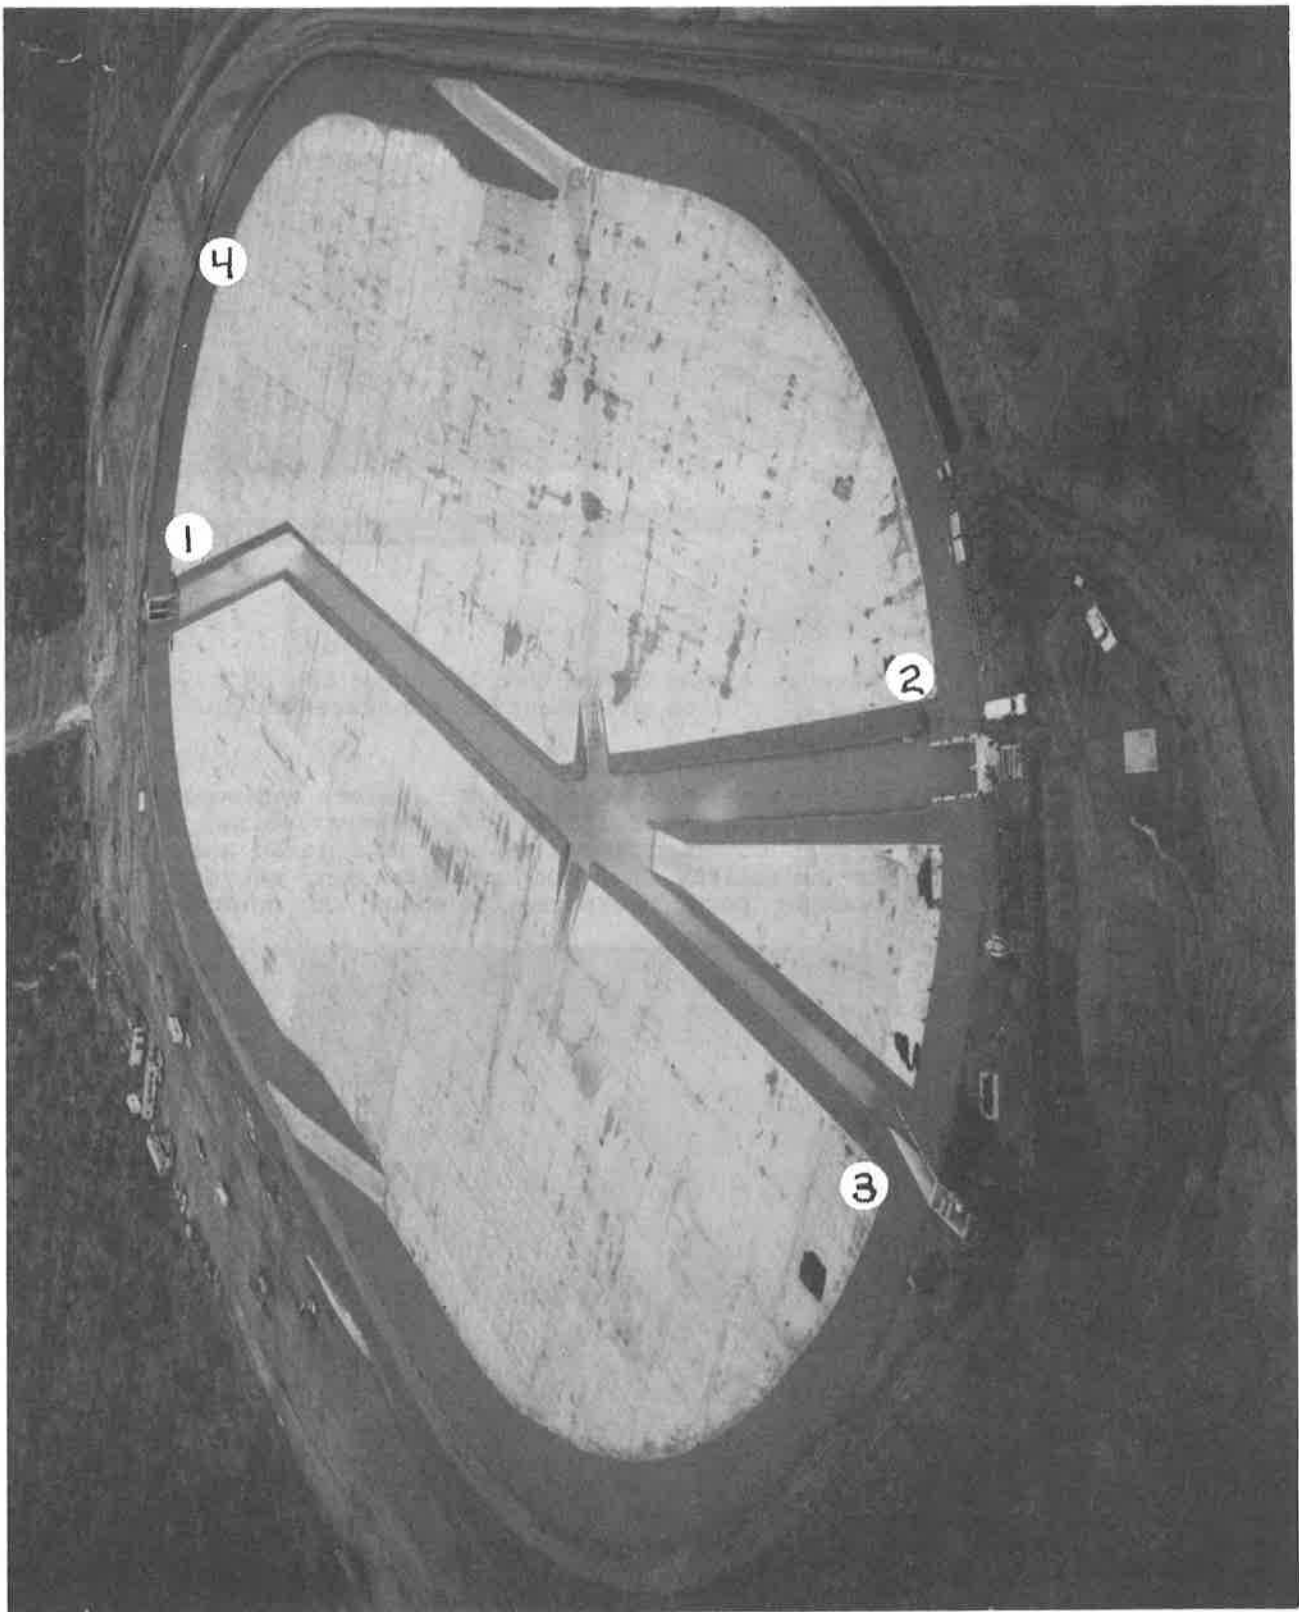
An October 2, 1990, aerial view of the Black Mountain Operating Reservoir during its construction. Looking south. 1) Reach Six Inlet Structure. 2) The San Xavier Turnout. 3) Black Mountain Outlet Structure. 4) Emergency Spillway.
